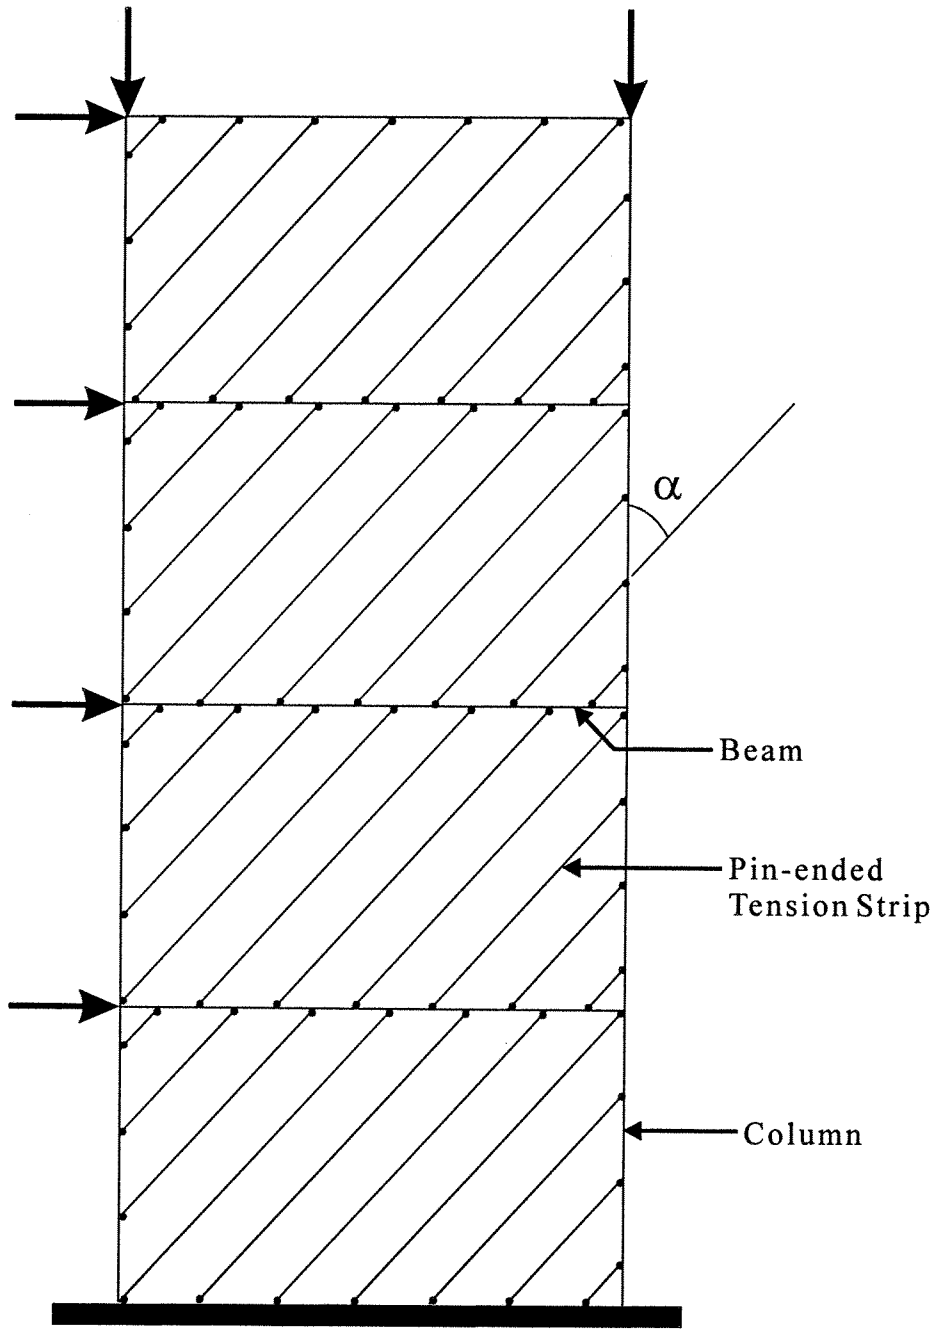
Plane Frame Strip Model of Test Specimen
